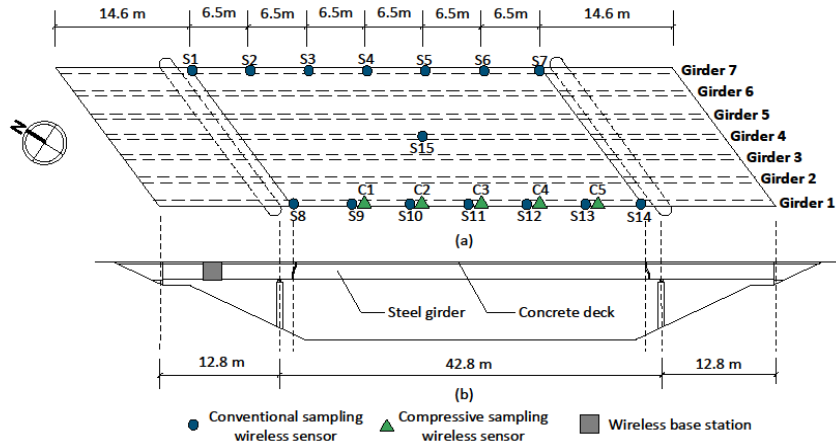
Sensor layout on the Telegraph Road Bridge: (a) top view; (b) side view.
